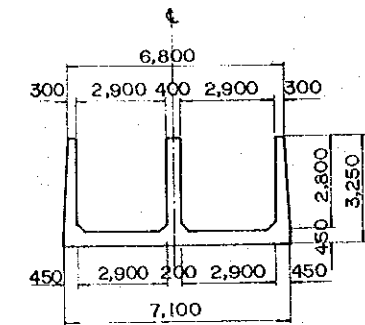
, (9) Plan of Intake and Settling Basin
